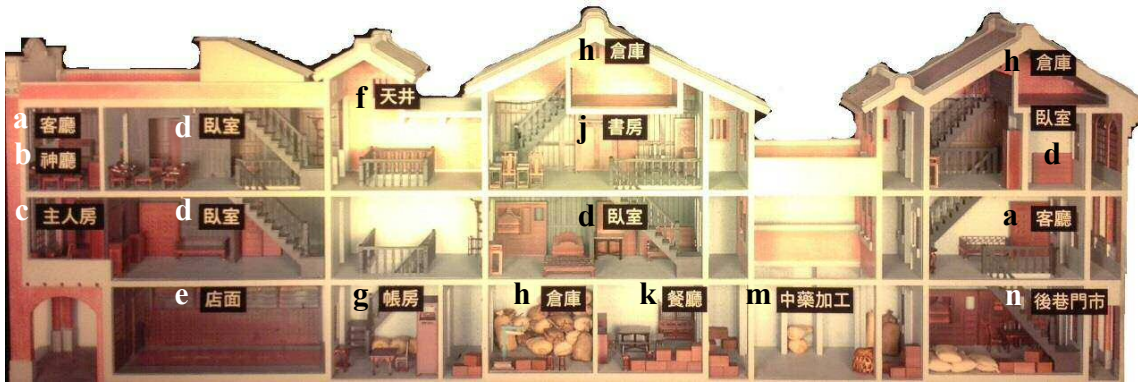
Long section of typical early shophouse building in Taipei City. (Source: Taipei Story House, photographs taken by author, 2012)
